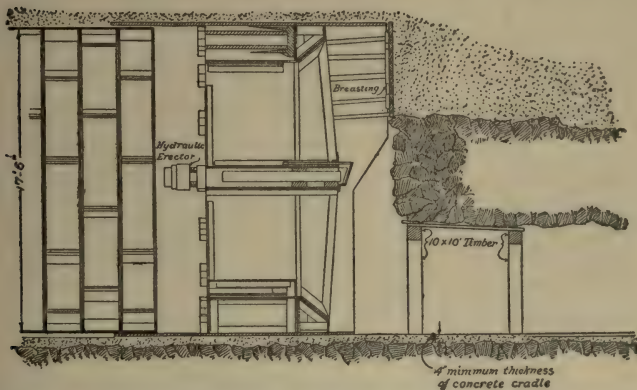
HOW THE TUNNEL IS EXCAVATED WHEN ITS FLOOR IS IN ROCK AND ITS ROOF IN SAND.
